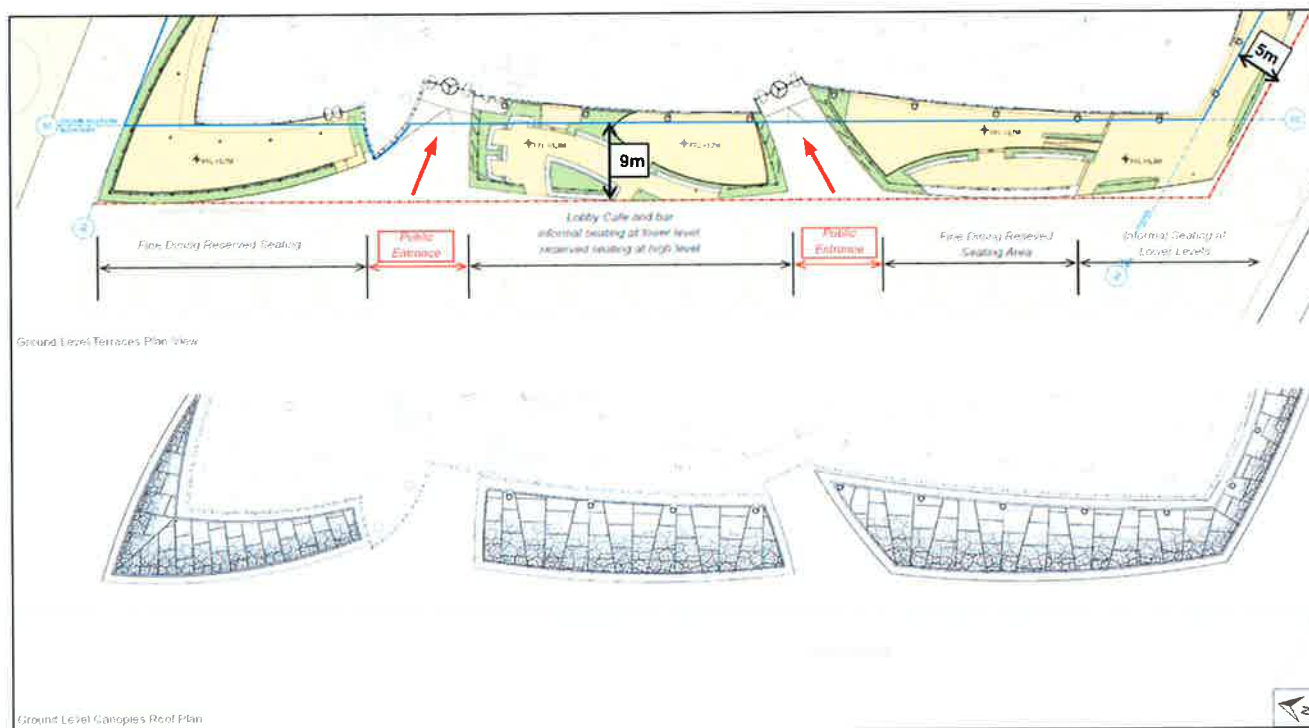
Ground floor level outdoor seating (terrace) licensed area and landscaping (top) and glazed canopies (bottom) (Base source: Applicant's EIS – as exhibited)
